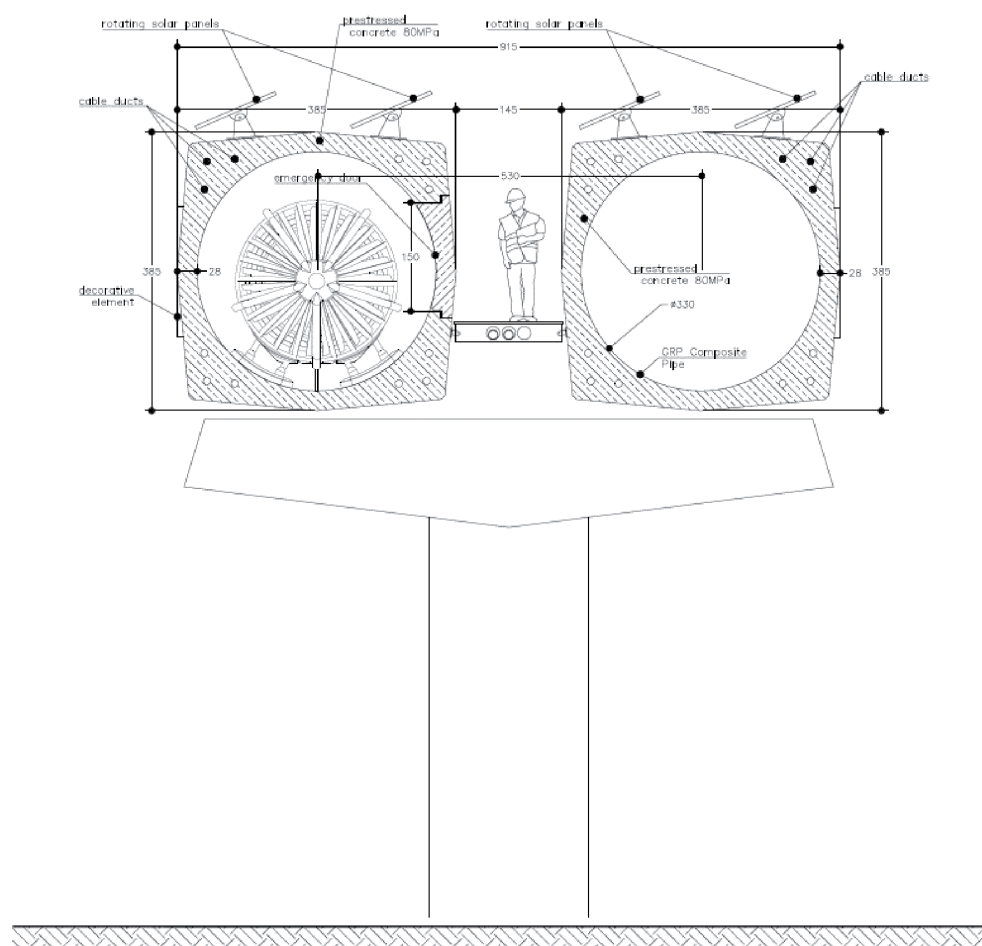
Hyperloop's prestressed concrete tubes on pylons [9]
